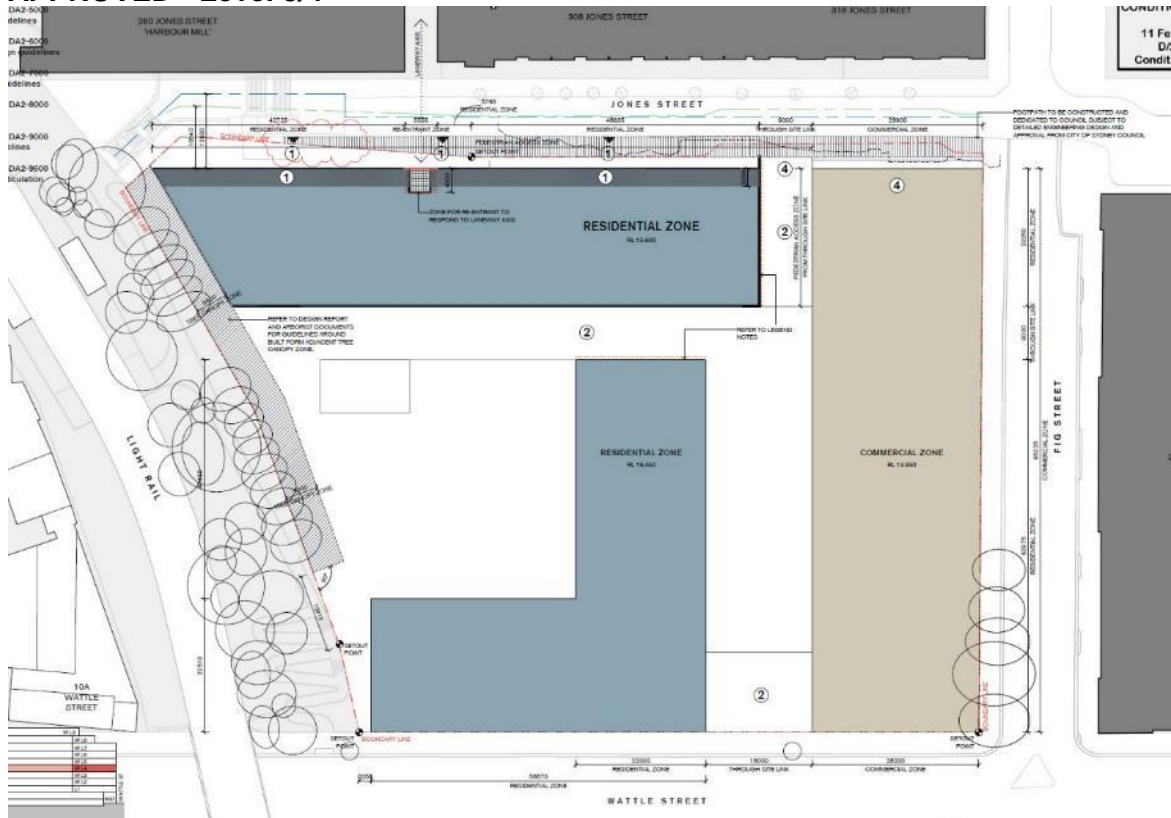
Envelope plans: Approved Level 2/3 and proposed Level 04
